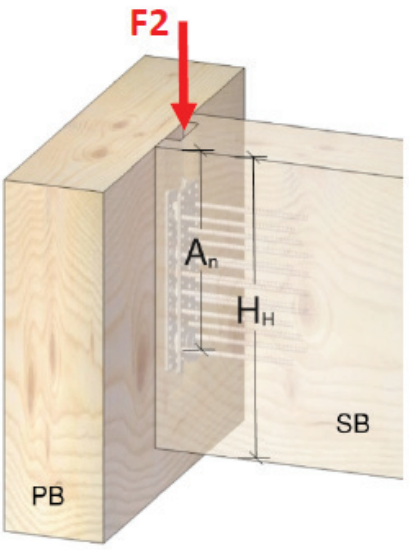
, Design force F_2 with single RICON® S VS connector [PB="primary beam" (or column)," SB="secondary beam"]
